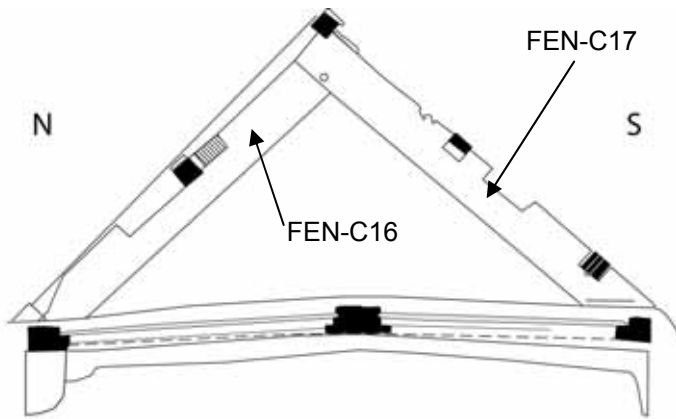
Truss 7, showing the location of samples FEN-C16 and FEN-C17 (based on Truss 4, provided by John Allen)
